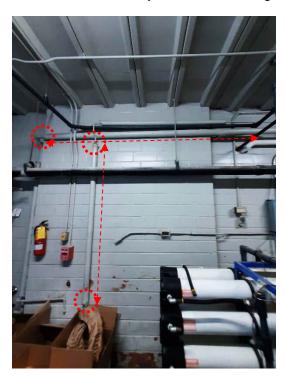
73 Delhi Street – Ground Floor Security Office Storage Closet, June 26, 2023. One of several locations where asbestos pipe insulation was discovered above solid plaster ceilings. It is likely that additional asbestos-containing pipe and fitting insulation will be found above such surfaces including plumbing risers and wall cavities. Care should be taken when accessing solid ceiling and wall spaces due to the possibility of asbestos debris Sample analysis confirmed the plaster as non-asbestos containing (S19B).
